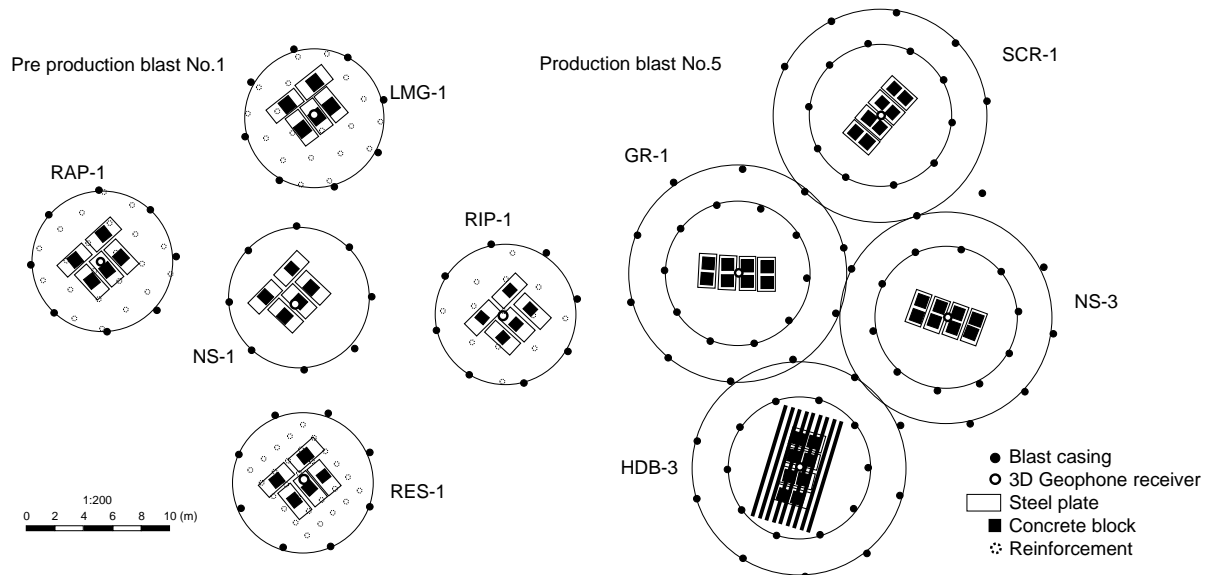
Example of the blast test layout employed at the site 4 in Avondale (adapted from Earthquake Commission 2014)
